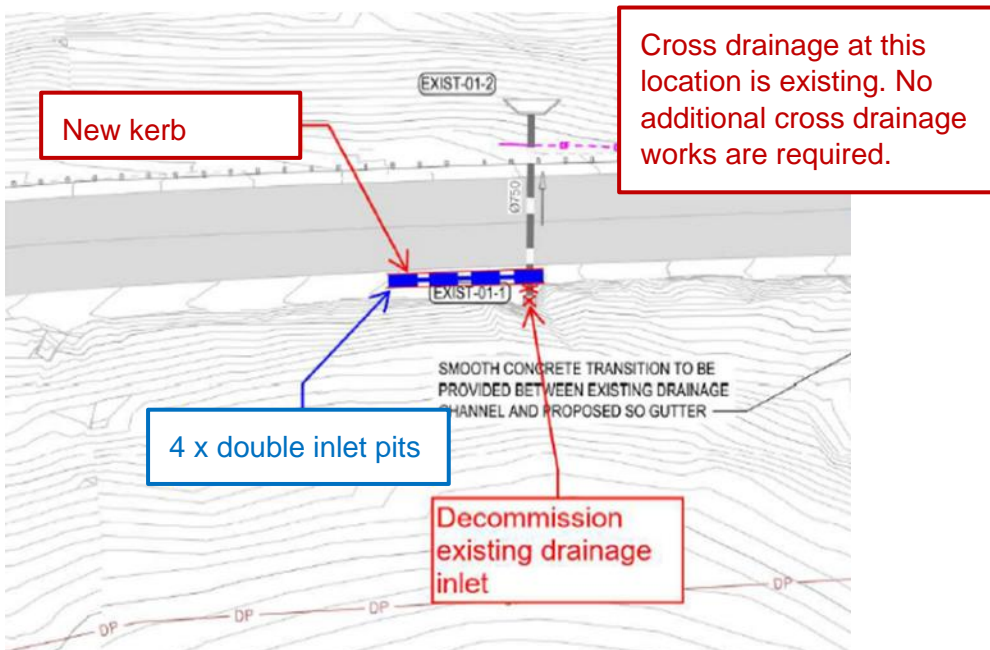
Proposed drainage line about 30 metres north of the approved REF boundary
